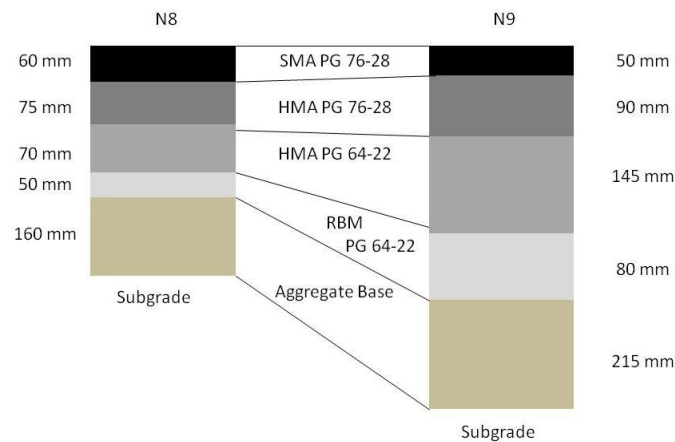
NCAT Perpetual Pavement Cross-Section
